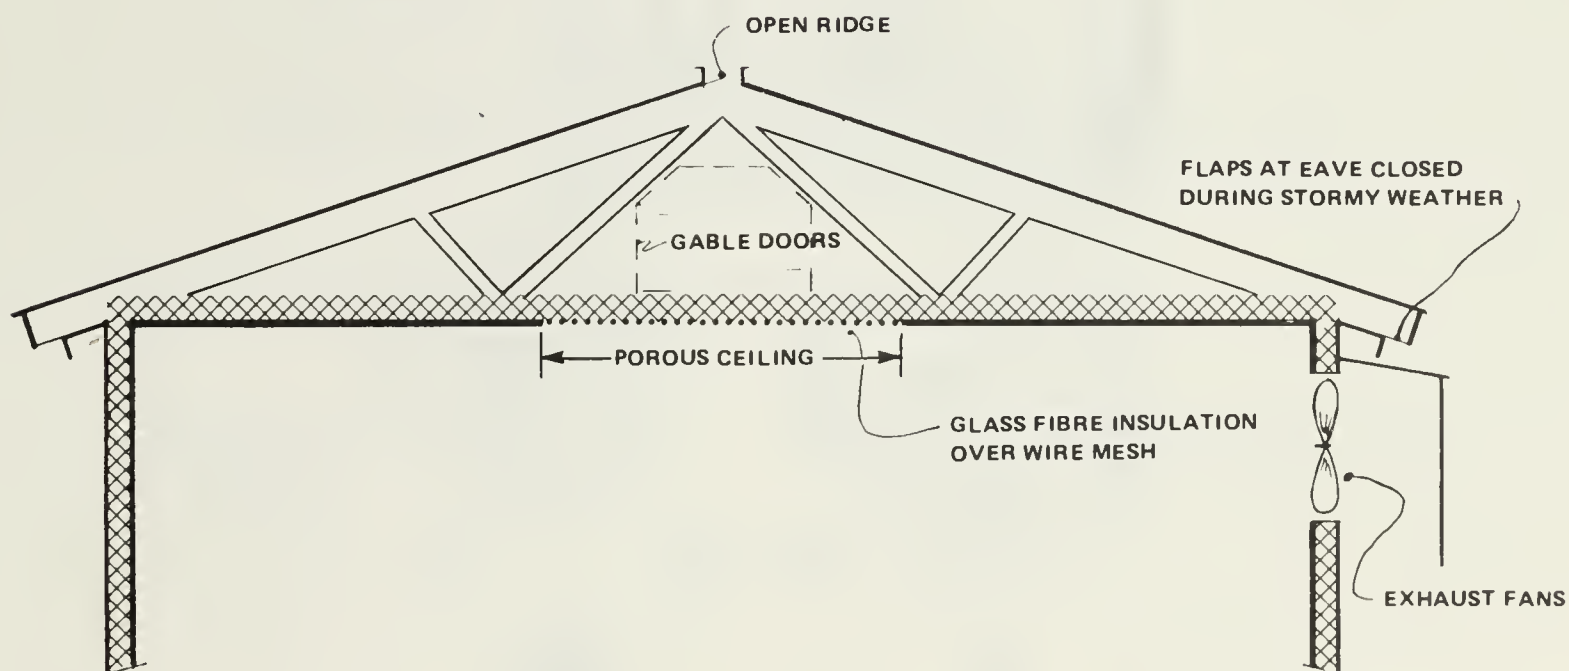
Cross-section of a barn with porous ceiling ventilation.
